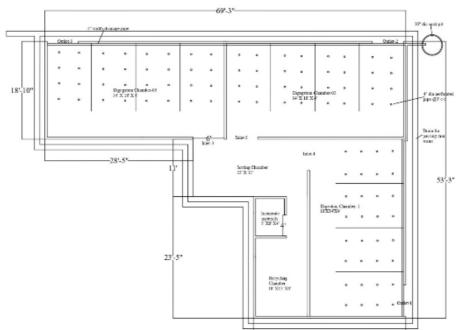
PLAN OF COMPOST PLAN AT CAMP 1E
